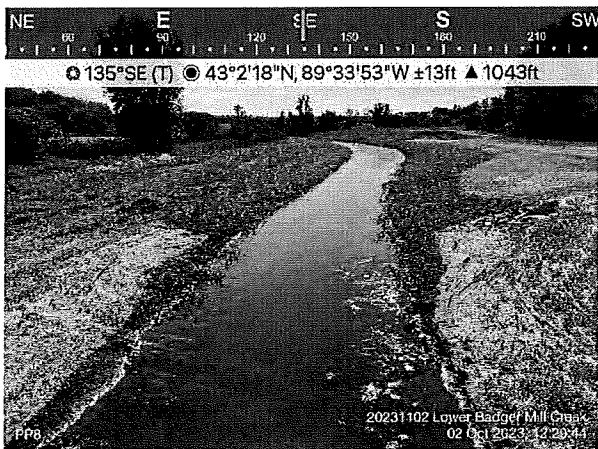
Photo point 8, view southeast from bridge along Lower Badger Mill Creek
